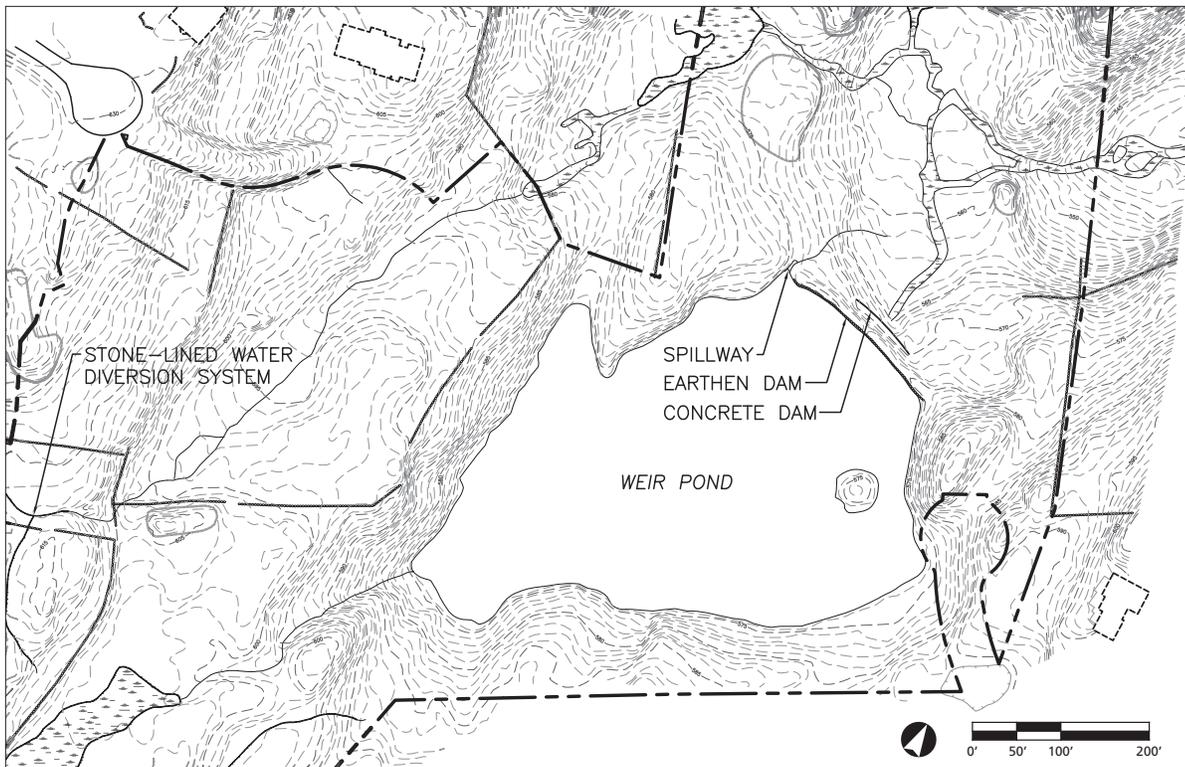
Site plan showing Weir Pond and dam. Weir Pond covers approximately four acres and relies on an earthen dam along its northeast perimeter to retain water. Approximately twenty feet downstream from the earthen dam, an eighty-foot long concrete dam was added to reinforce the earthen structure, 2010 (OCLP).
